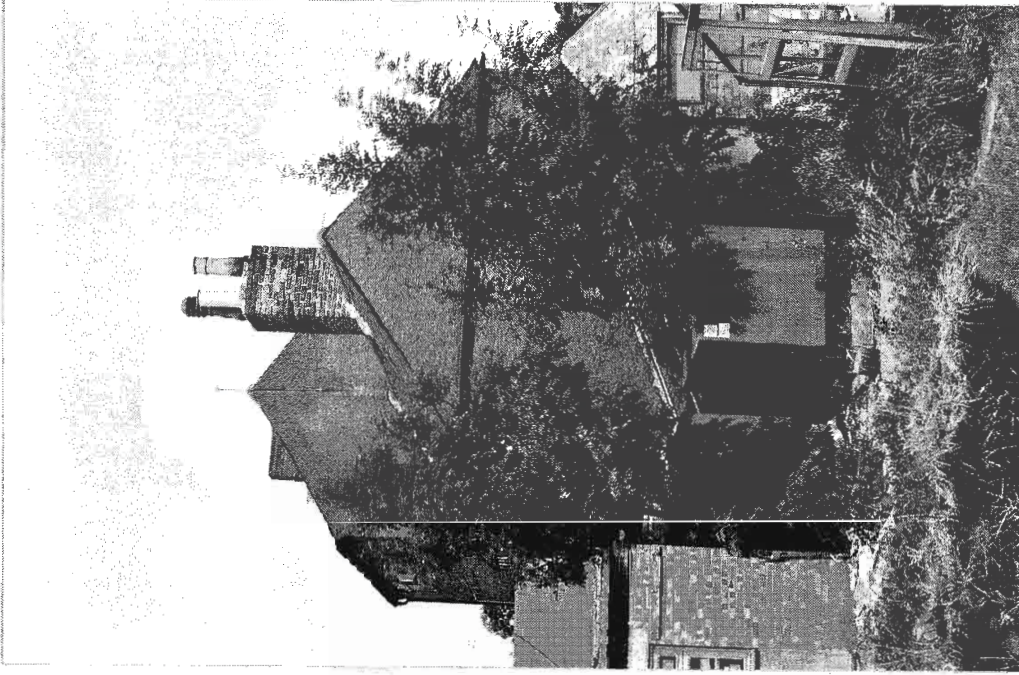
, 14 Views of the west elevation of the Bath Hotel showing the extensive infill. The two pitched roofs belong to earlier buildings that were part of the original farmstead.
